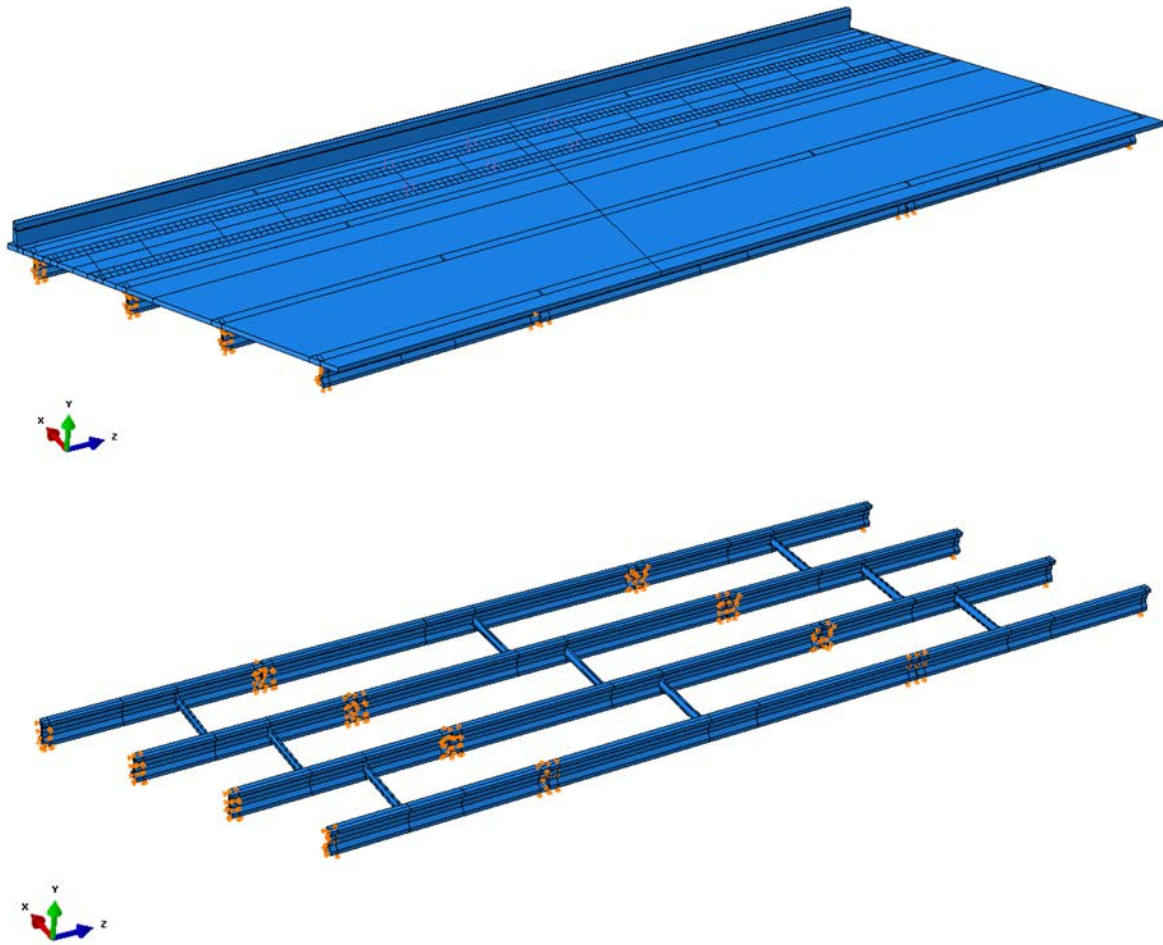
Top: Isometric view of finite element model for B-64-123. Bottom: Concrete deck hidden to show bridge framing and boundary conditions.
